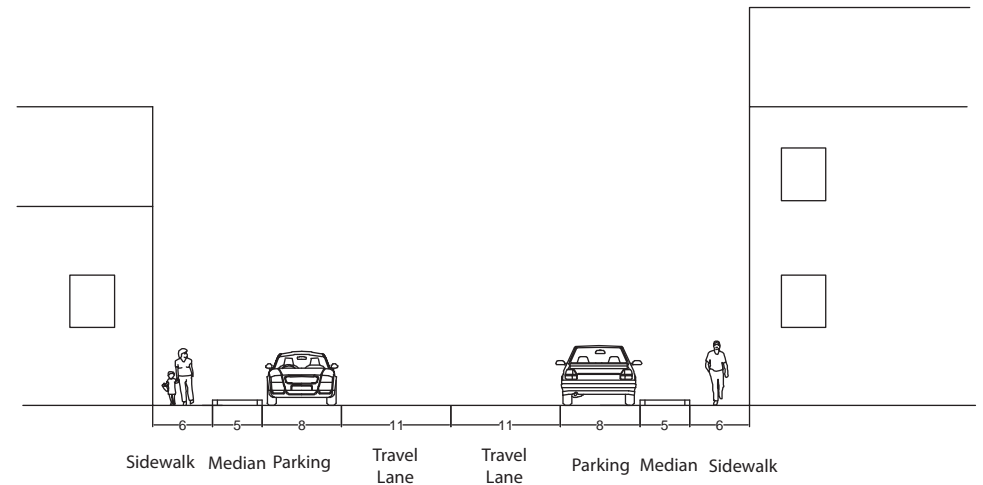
Hill Street proposed section with sidewalks and parallel parking
